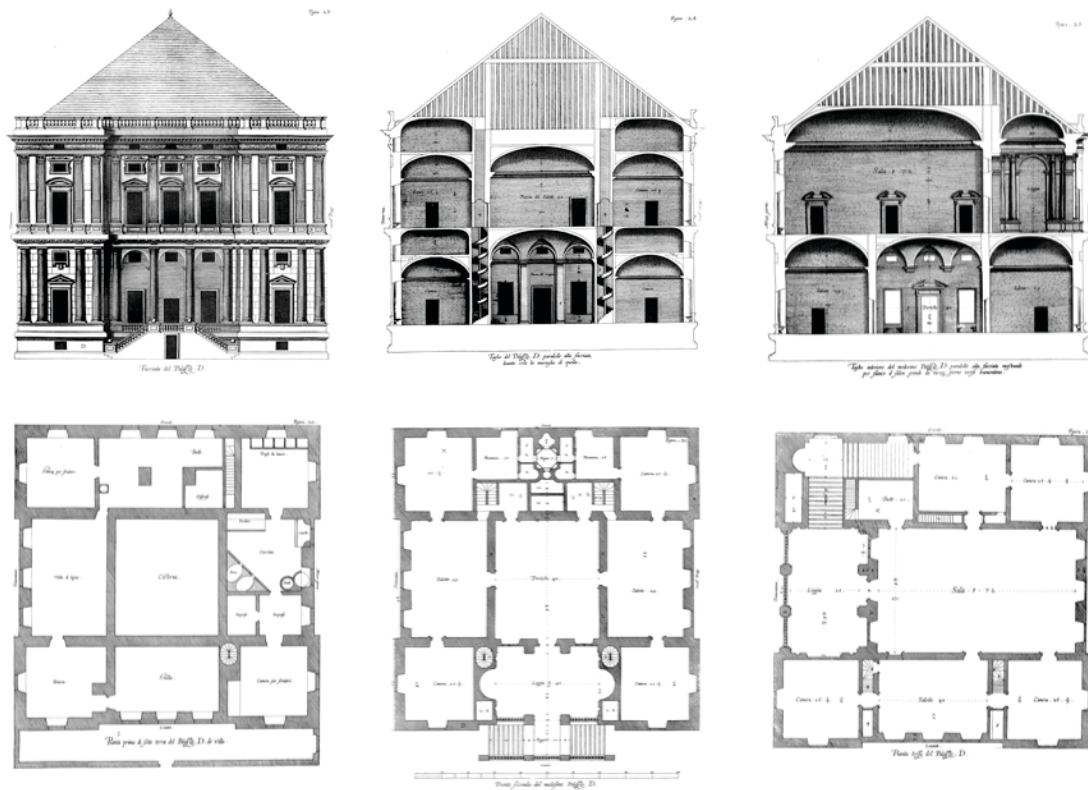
Façade, cross sections and floor plans of palazzo D, *Palazzi di Genova*, 1622, Peter Paul Rubens and Galeazzo Alessi.
